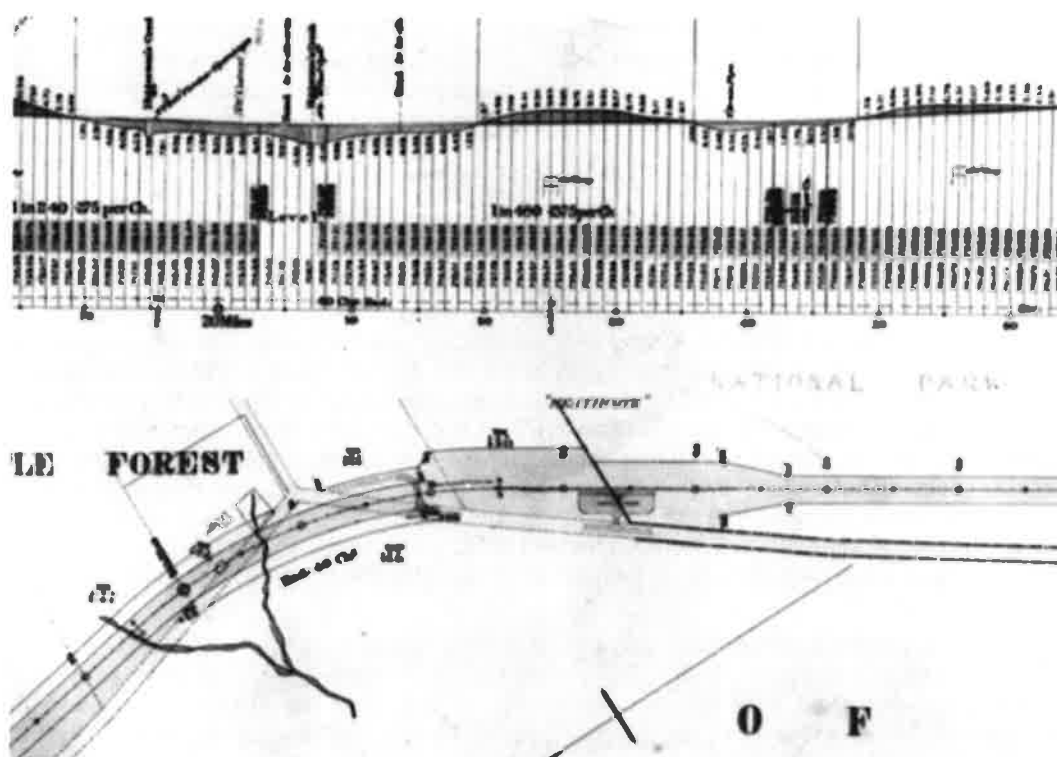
The railway working plan did not show Heathcote Hall. Source – Illawarra railway, working plan, SNSW R 560, No L14, n.d.
